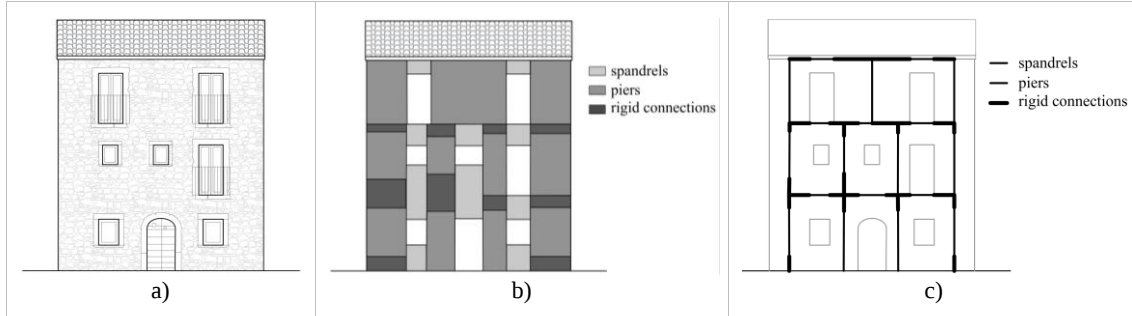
Identification of the equivalent frame for a generic archetype building: a) front wall of the archetype building; b) identification of spandrels, piers, and rigid connections; c) equivalent frame scheme with beam elements.
